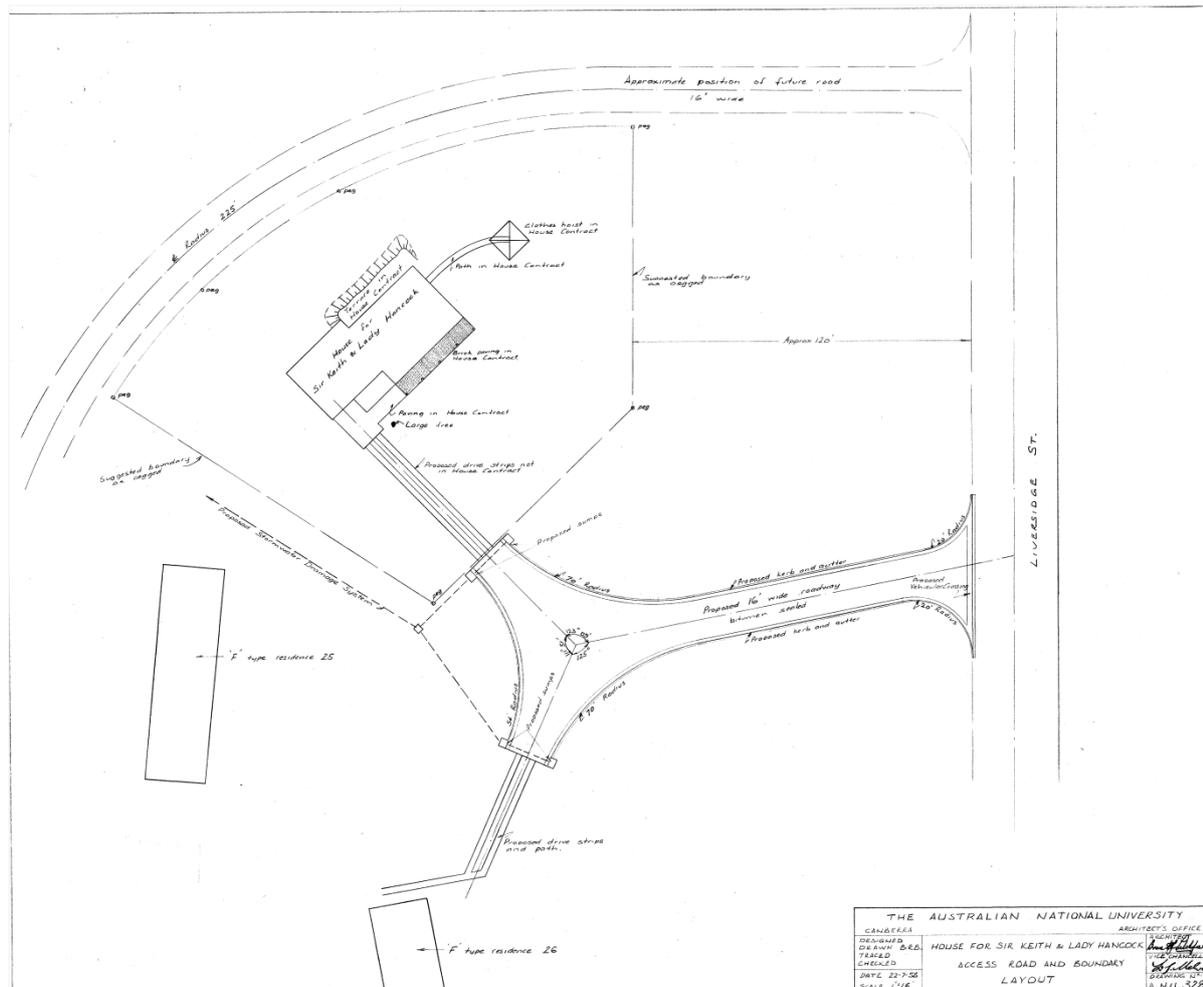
Site plan for 14 Liversidge Street. Initially the house for Sir Keith and Lady Hancock. Architect Bruce Litchfield Drawn 22/7/1958.
